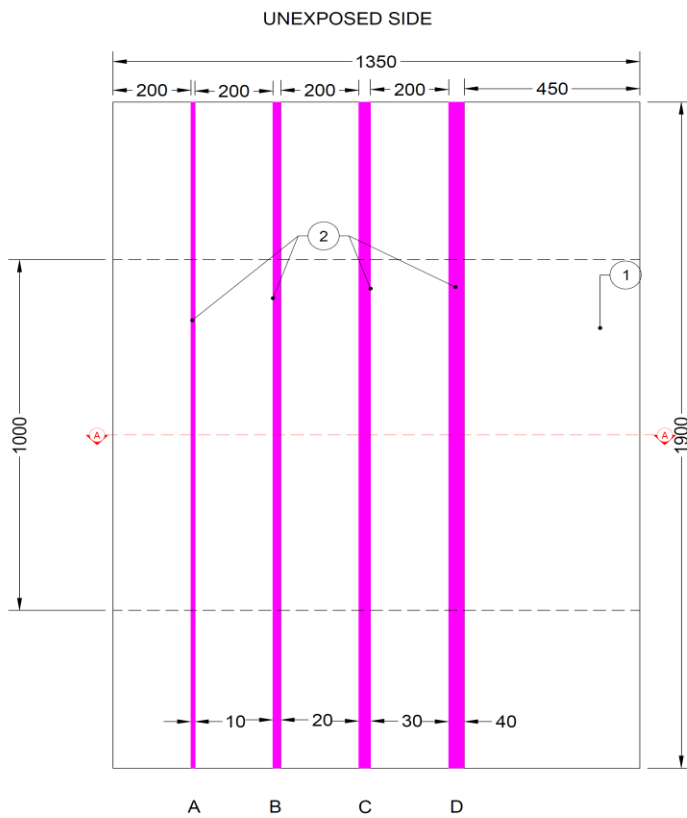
Elevation of test specimen wall and control joints from unexposed side.
